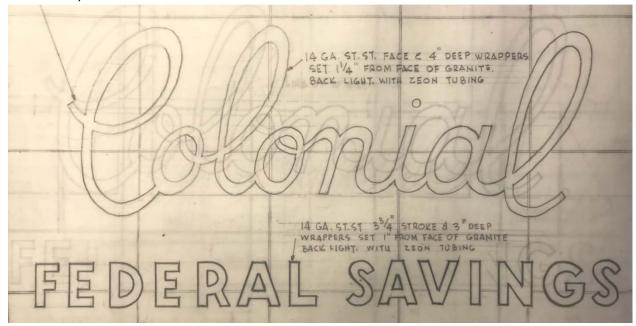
Signage Detail, Original drawing by architect Lee Casaccio, Alterations Colonial Federal Savings and Loan, Sheet 3 - Front Elevation and Details, 1962, courtesy of Lee Casaccio, Jr.
